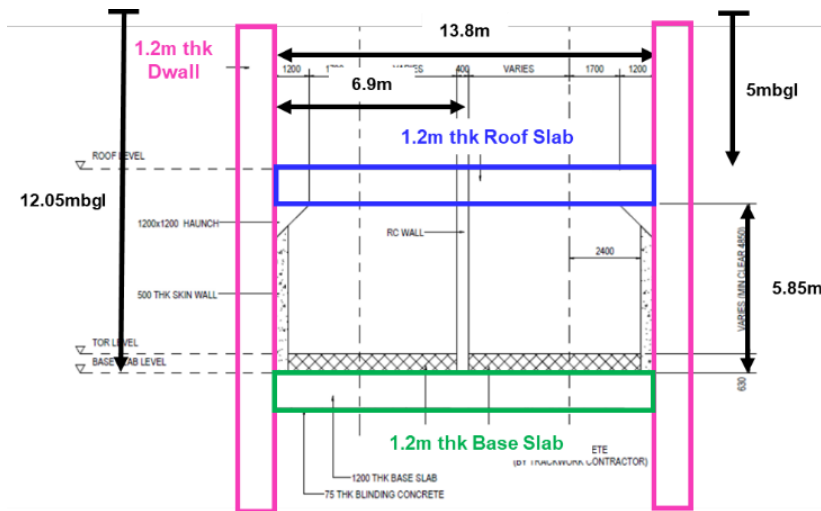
Typical cross section of C715 Cut-and-Cover Tunnel
